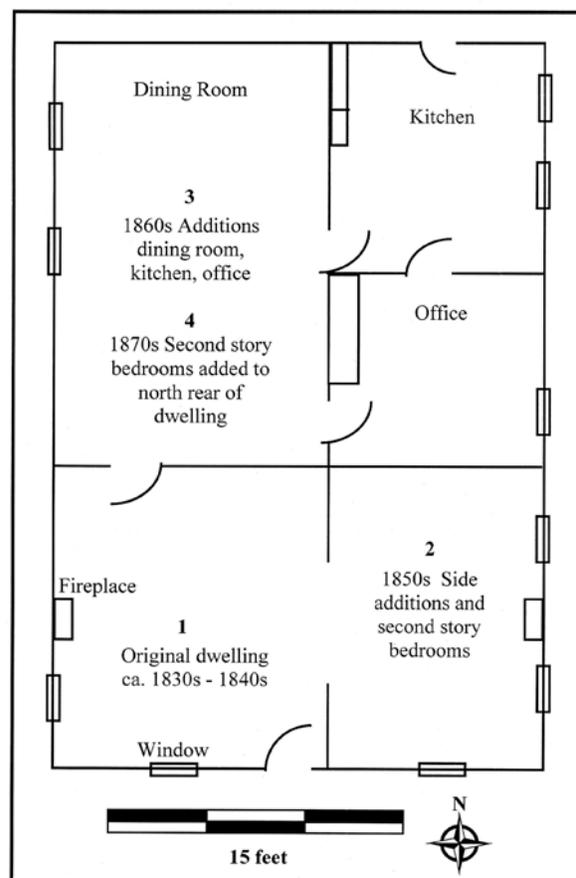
Floor plan showing additions to the Moore-Youse house over time.
